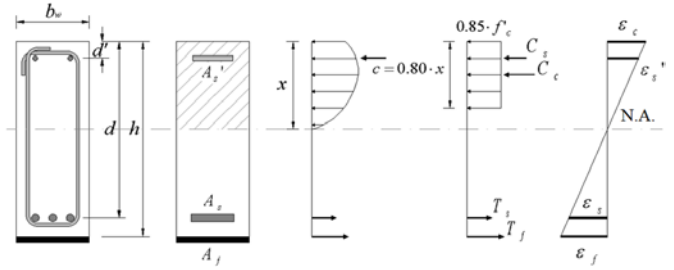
Mechanical behavior of reinforced concrete beams with CFRP
